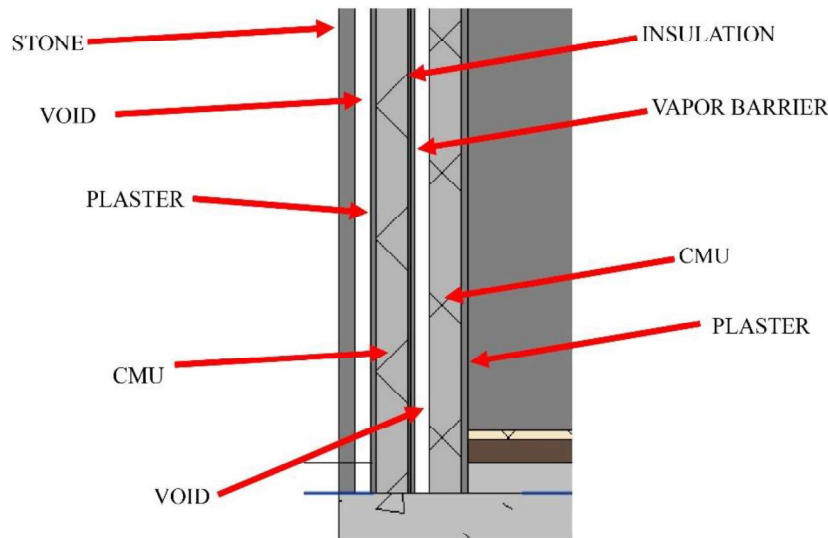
Wall section showing construction materials. Source: Revit Autodesk 2020 by Author
